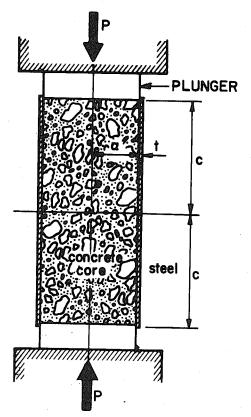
PROBLEM 2 — METHOD OF LOADING CONCRETE CORE ALONE
